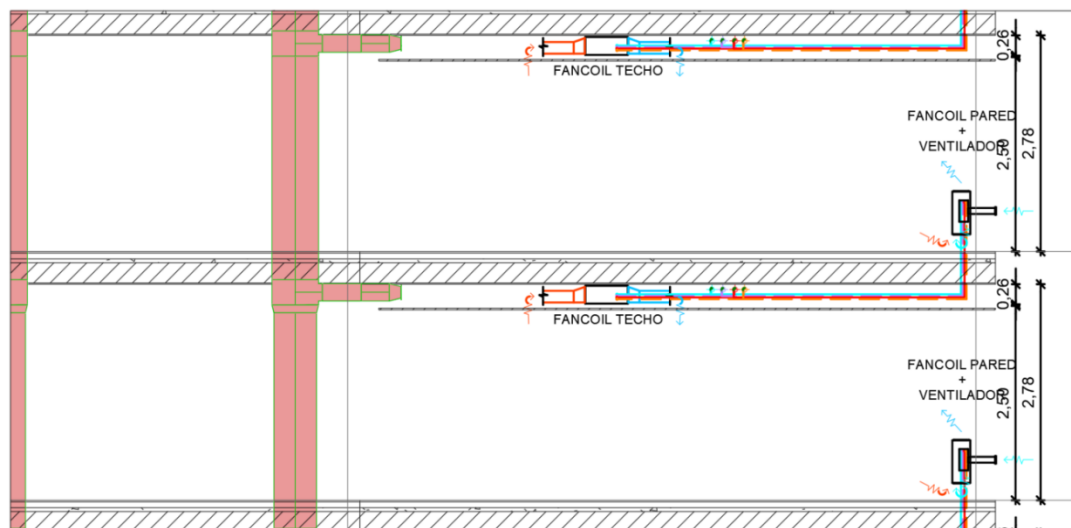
Plan section of standard plan, alternative 3 (source: AIGUASOL).
